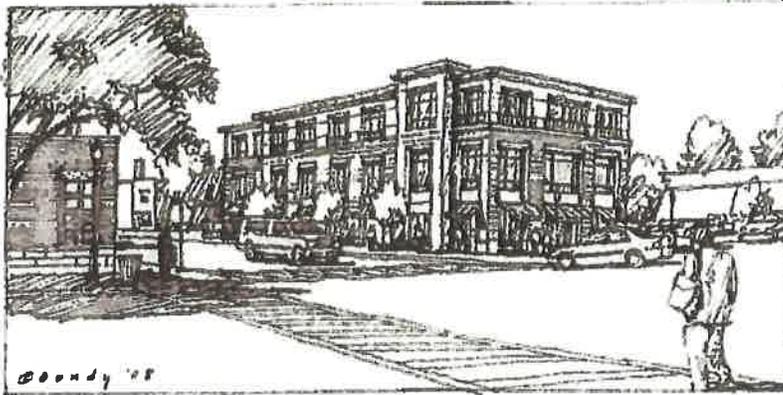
Perspective Sketch – New Mixed-Use Building at the Northwest Corner of Pennsylvania Avenue and Main Street. Source: Town Builder Studios.
